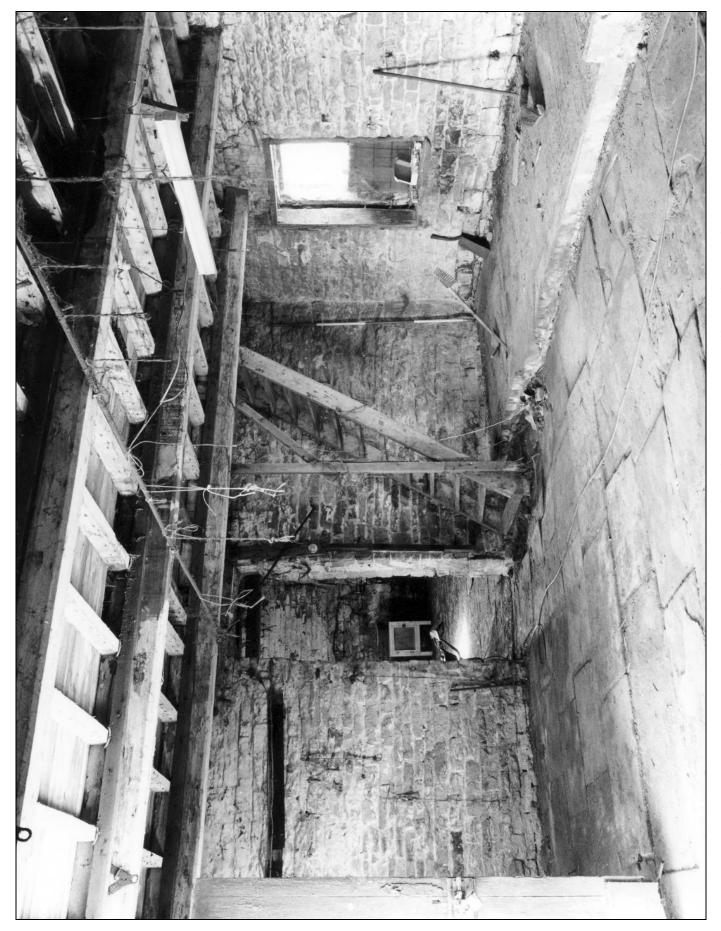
Building 1a: detail of taking-in doorway, south gable (film 3, frame 18)
